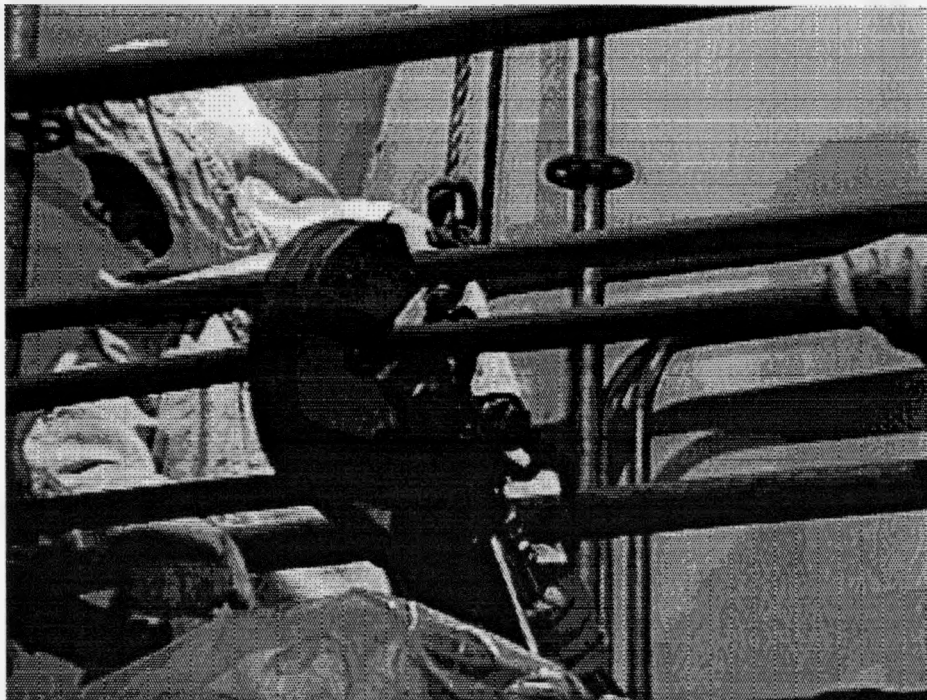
Cutting small bore pipe in the Auxiliary Chamber with the hydraulic shear.
